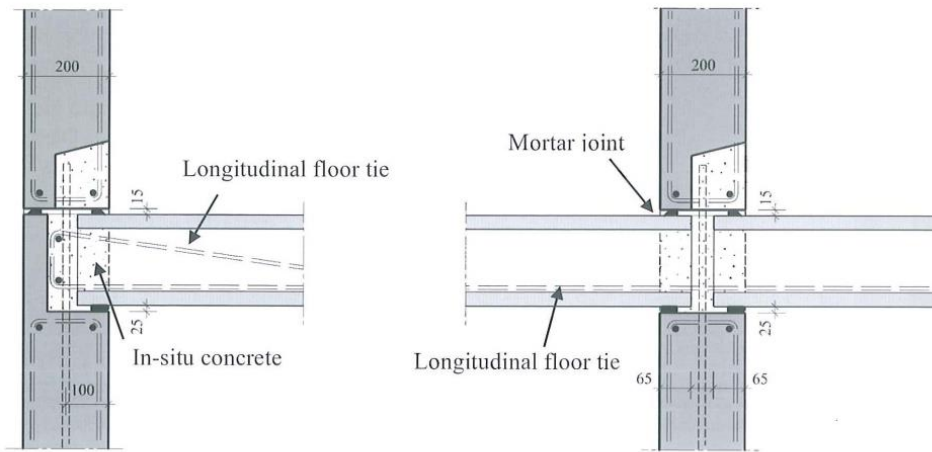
Wall-to-floor connections at intermediate load-bearing walls and hollow-core floor elements for building up to maximum 10 storeys.
